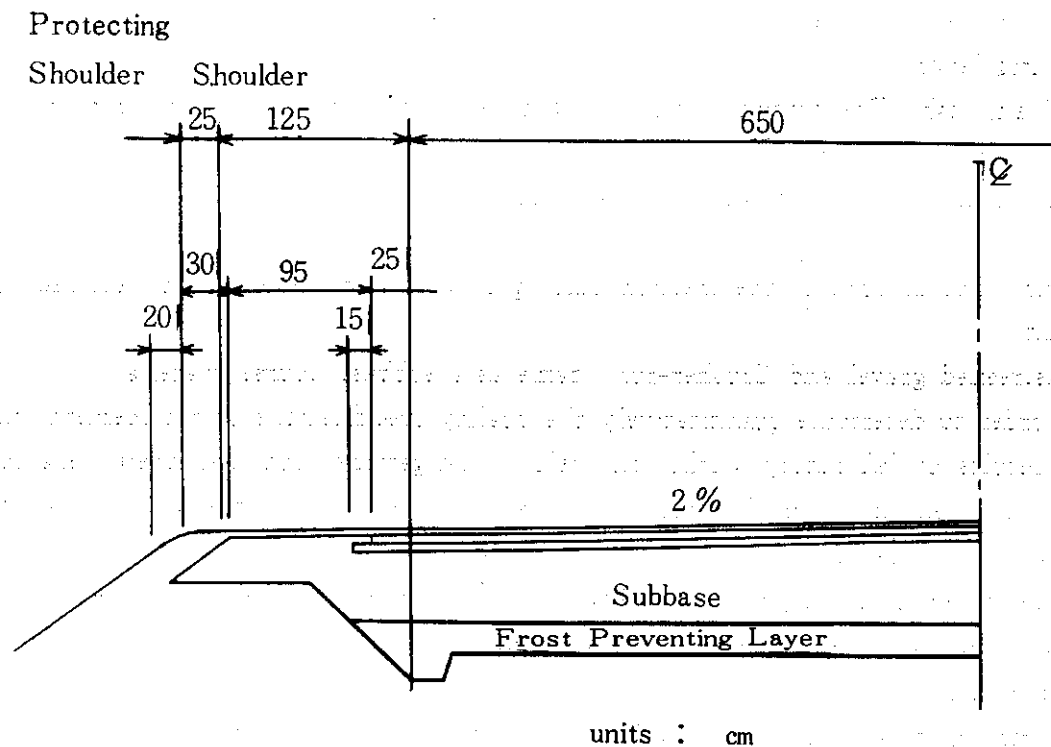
shows one of the examples in which the pavement structure was built up by a replacement method in Hokkaido Development Bureau.
